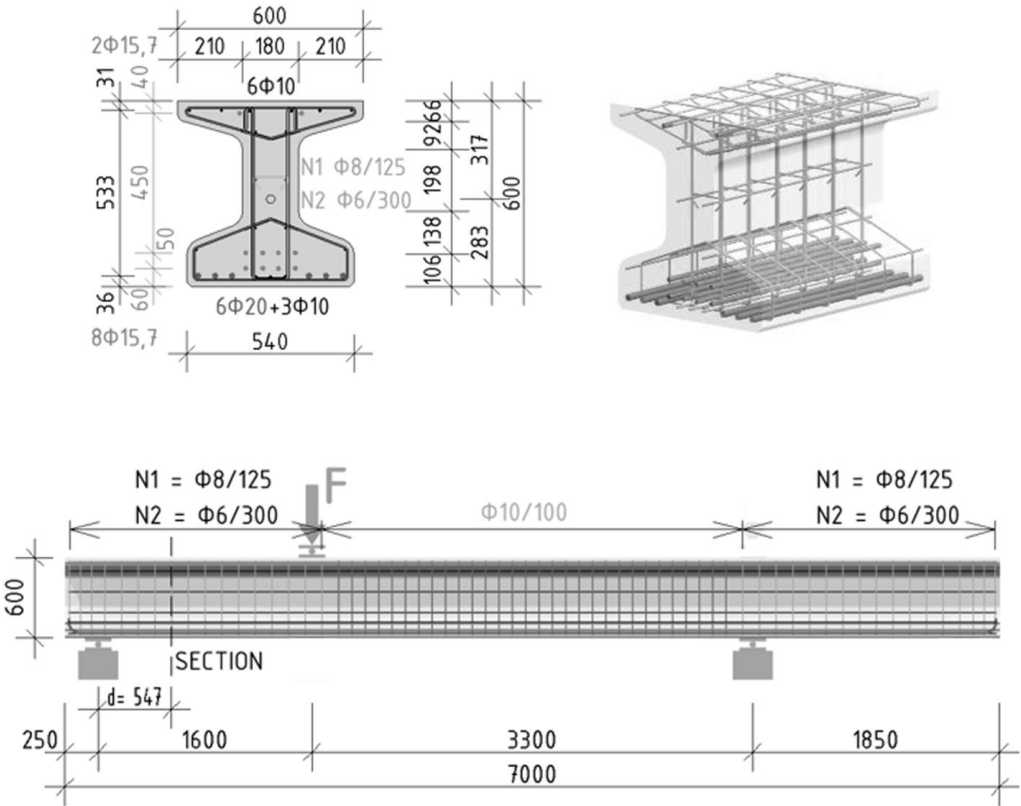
Reinforcement arrangement of the specimens: cross-section (top left), 3D view (top right), Side view (bottom)
